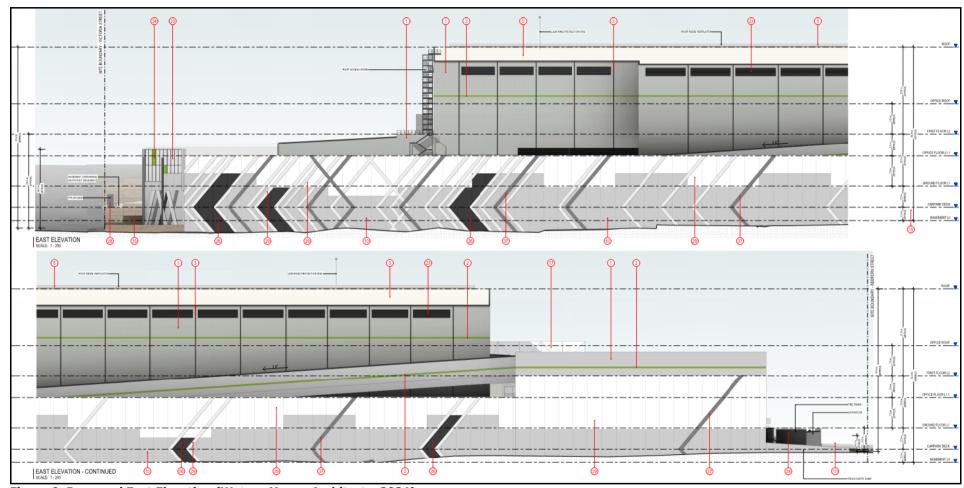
Proposed East Elevation (Watson Young Architects, 2021)
